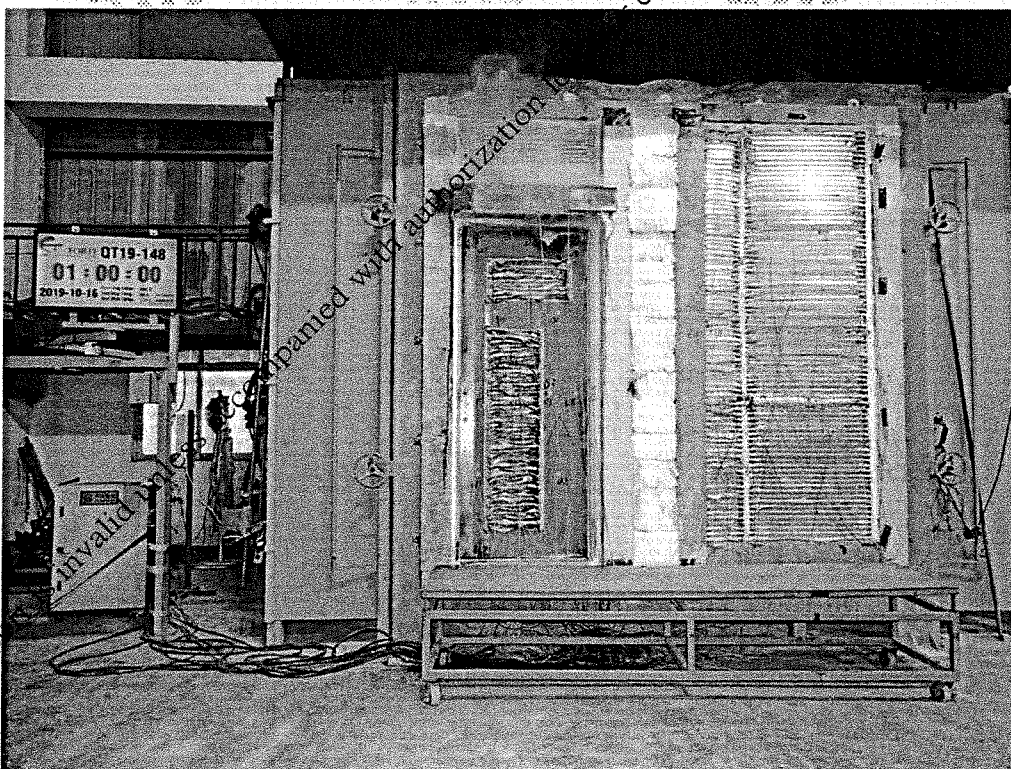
Unexposed surface of the specimens at 60 minutes of test.
